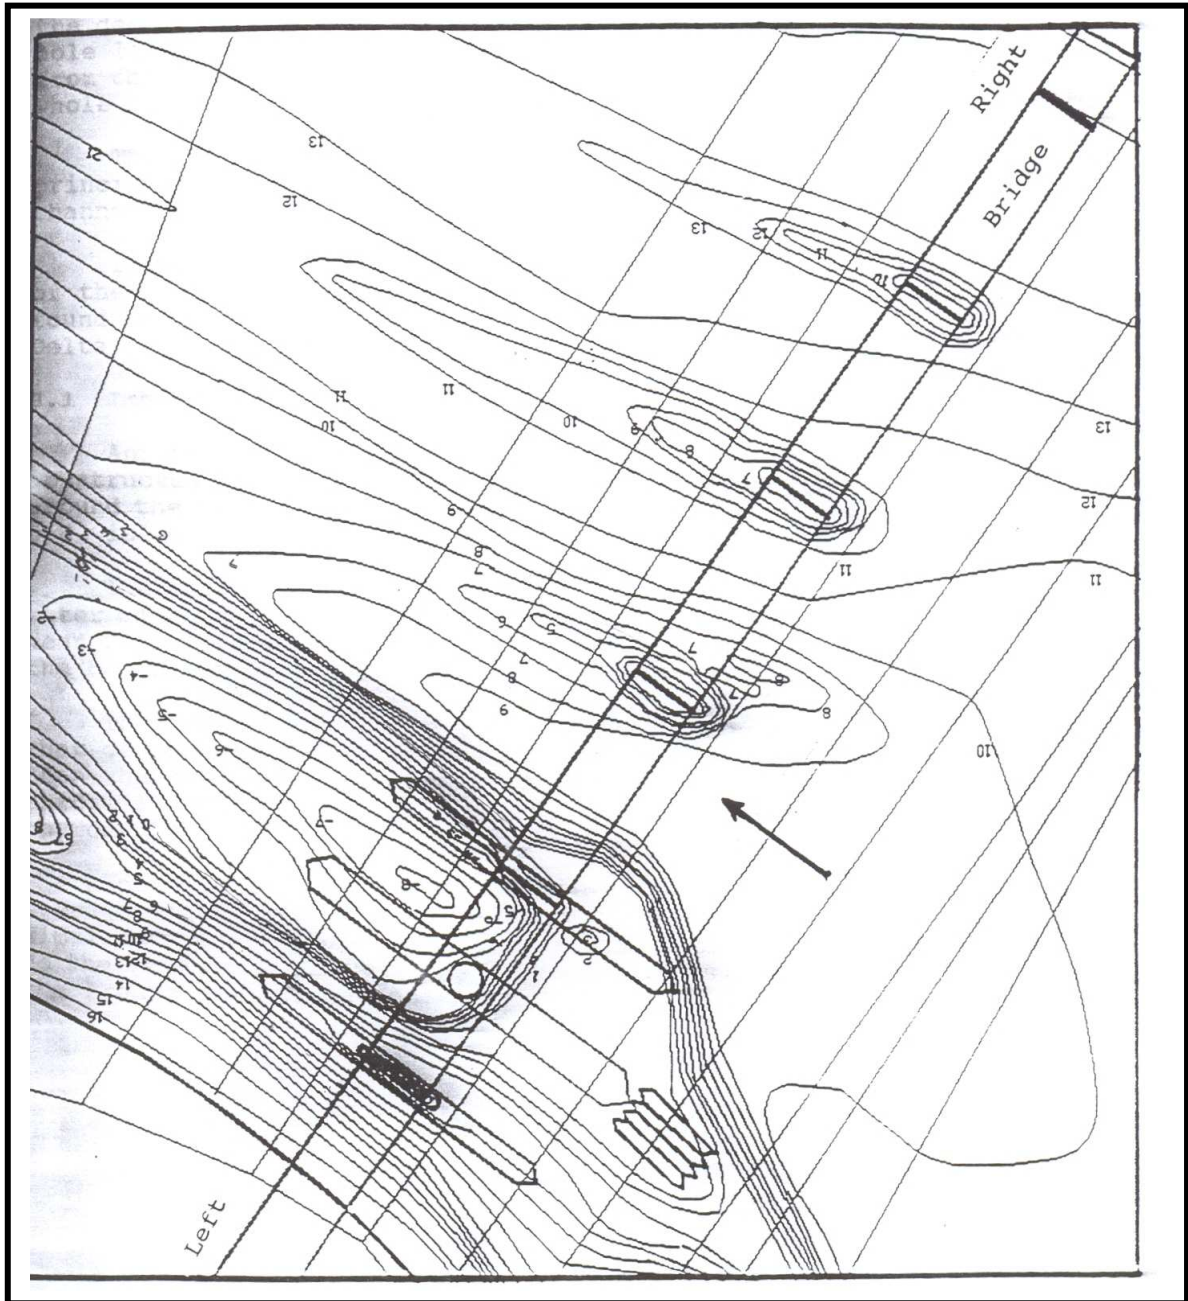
Cross-sections and the Piers location at the Center of Imbaba Bridge
